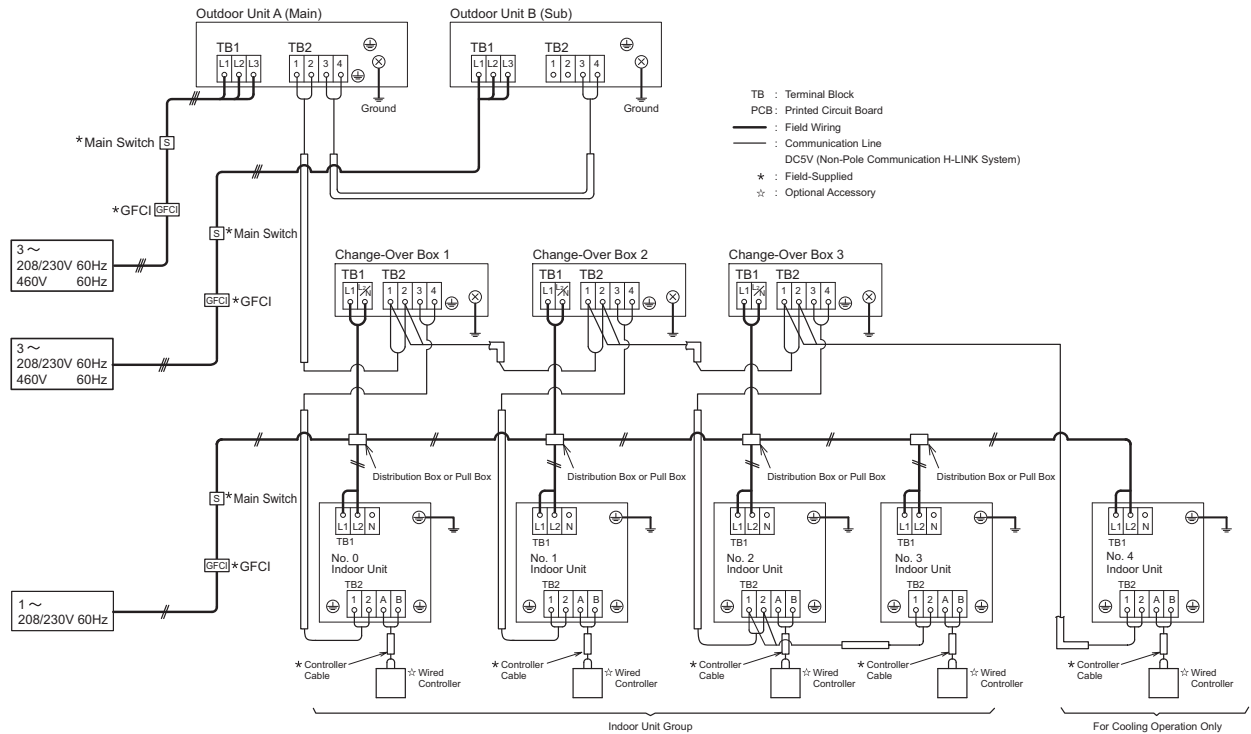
Instruction for Electrical Wiring Connection (Heat Recovery System)
